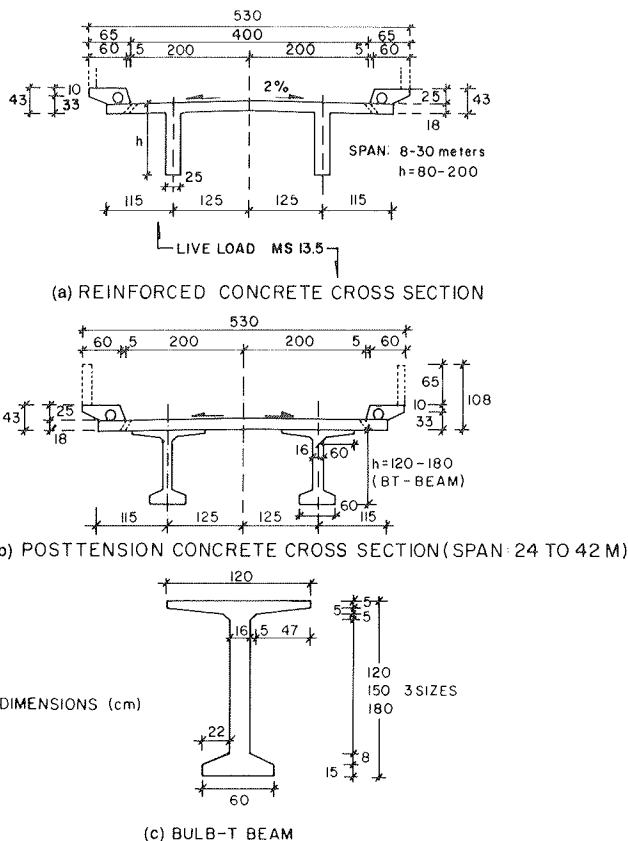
(a) One-lane reinforced concrete bridge cross-section; (b) one-lane post-tensioned concrete cross-section.
